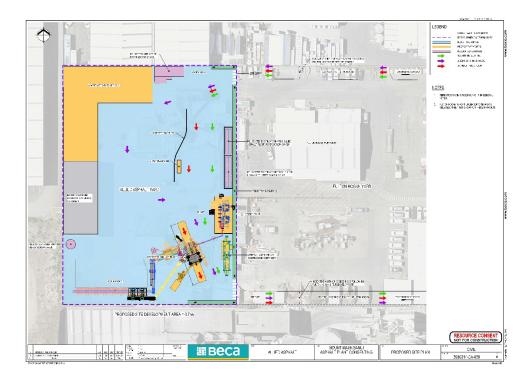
Site and asphalt plant layout at 54 and 48 Aerodrome Road.
